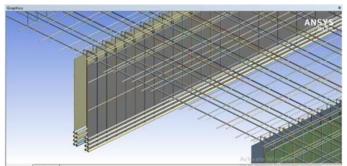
Position of mild steel strip (3.15mm) (Full depth of web)
